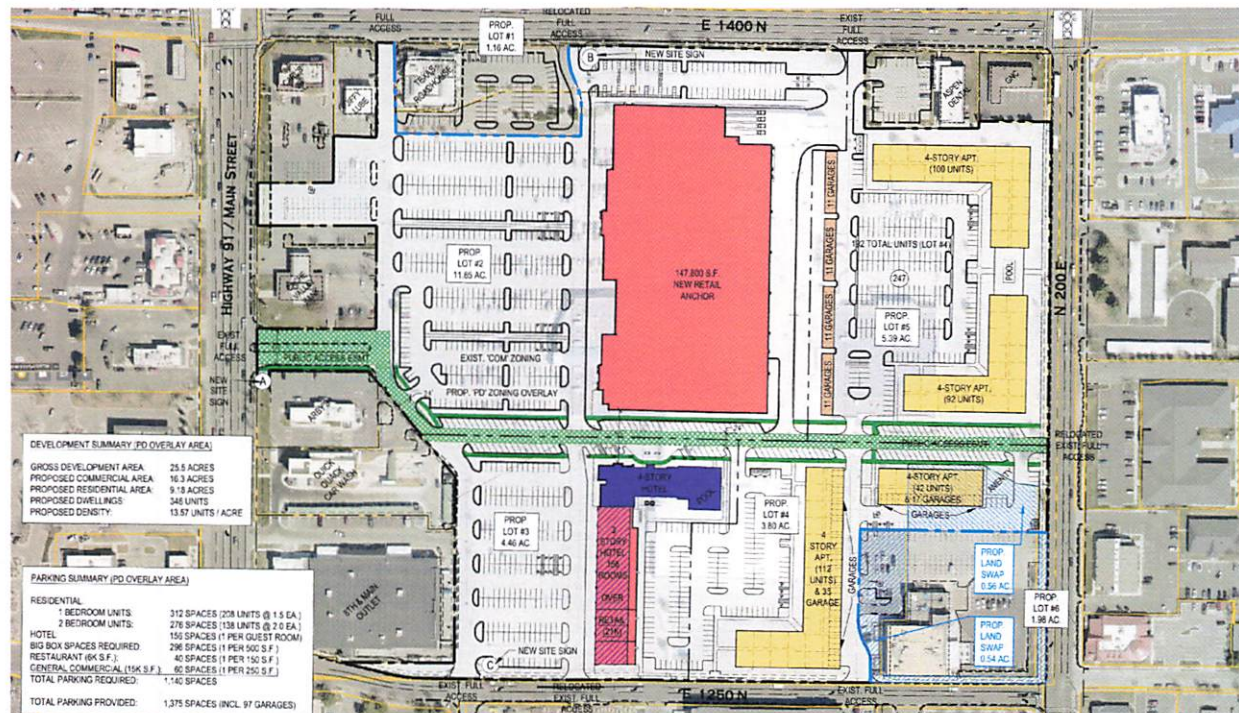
shows the original 2023 site plan with Target and Hotel (red and purple) and multi-family (yellow) buildings.
